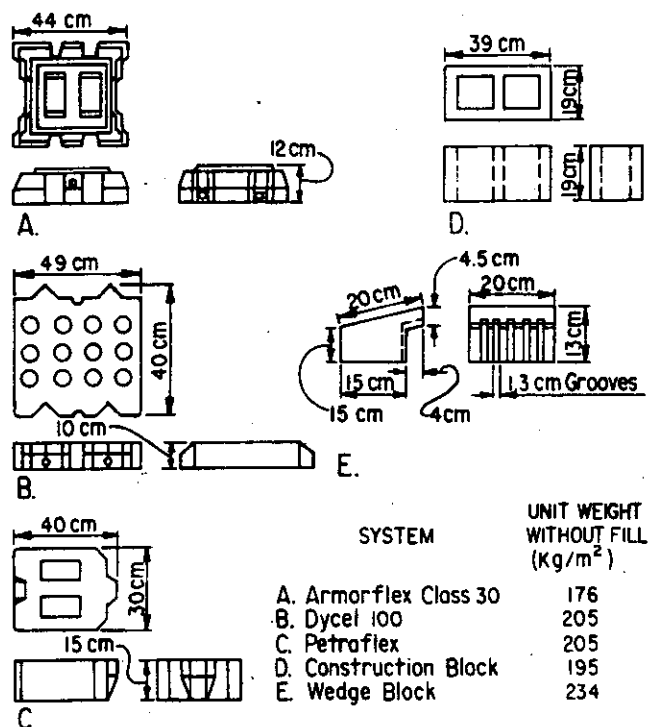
Sketches of five types of concrete blocks tested. (NOT TO SCALE)
